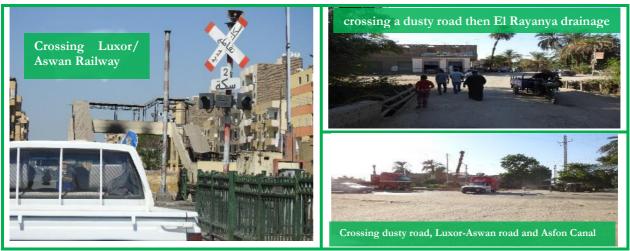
Pictures showing the proposed location HDD crossing in Luxor districts
